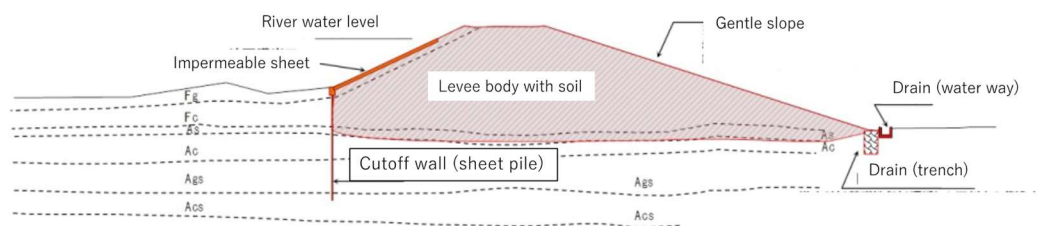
Design for Yabe River levee reinforcement including cutoff wall and drainage
